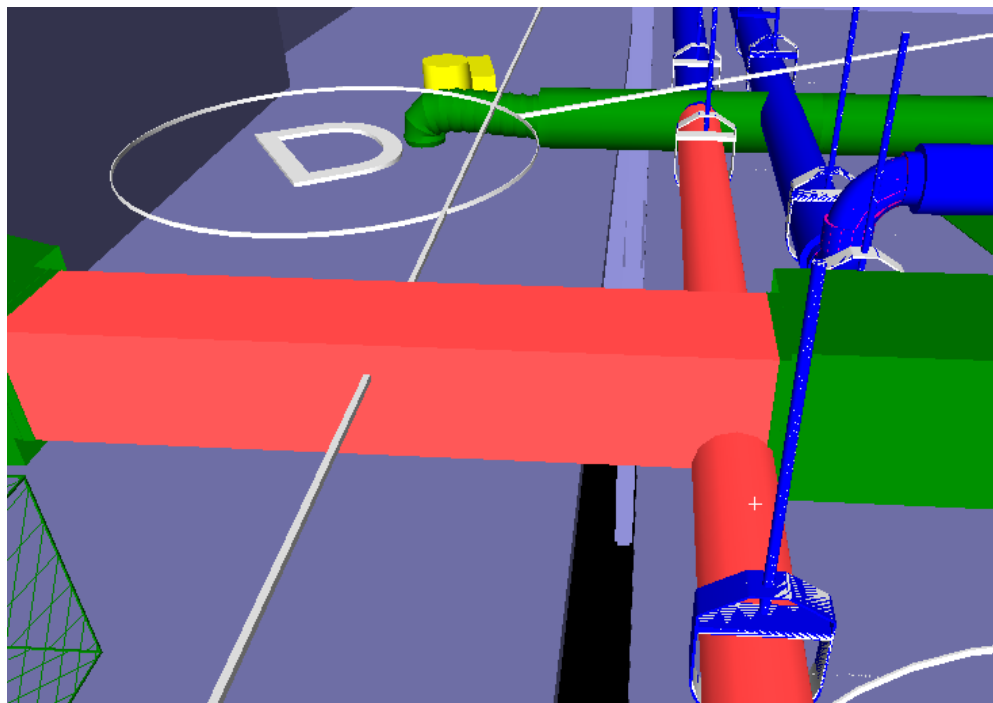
Example 8 – Raise Duct to Avoid Piping
